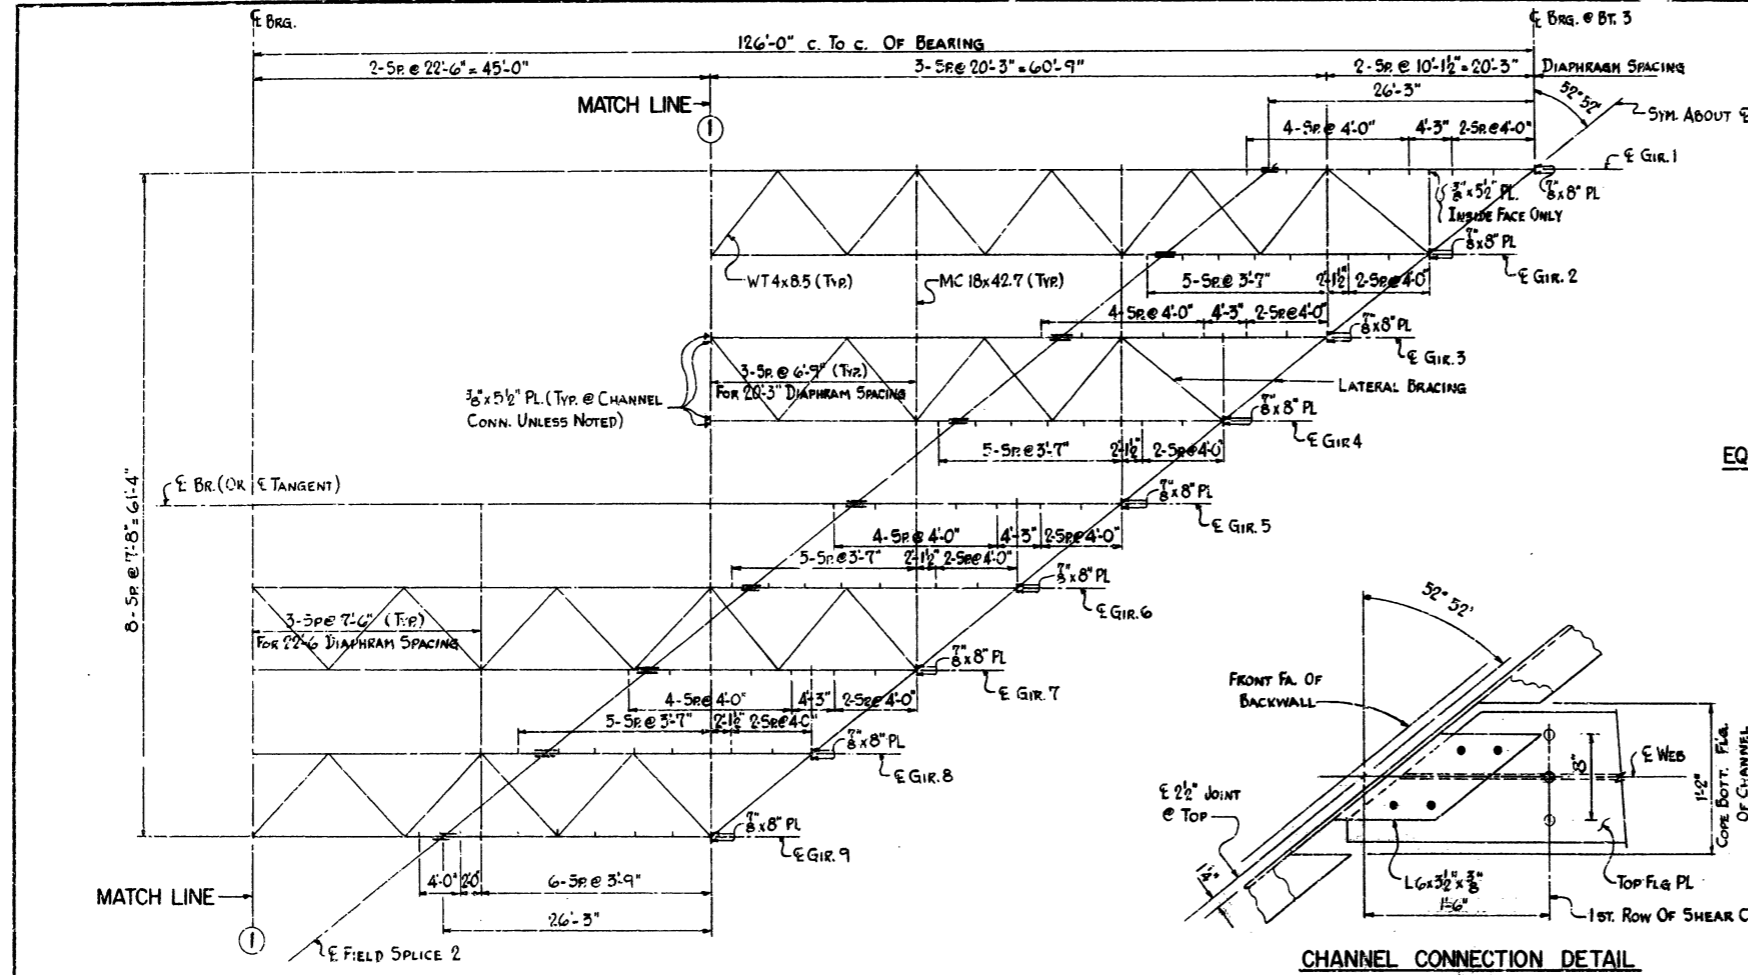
DETAILS OF CONTINUOUS WELDED PLATE GIRDER UNIT
